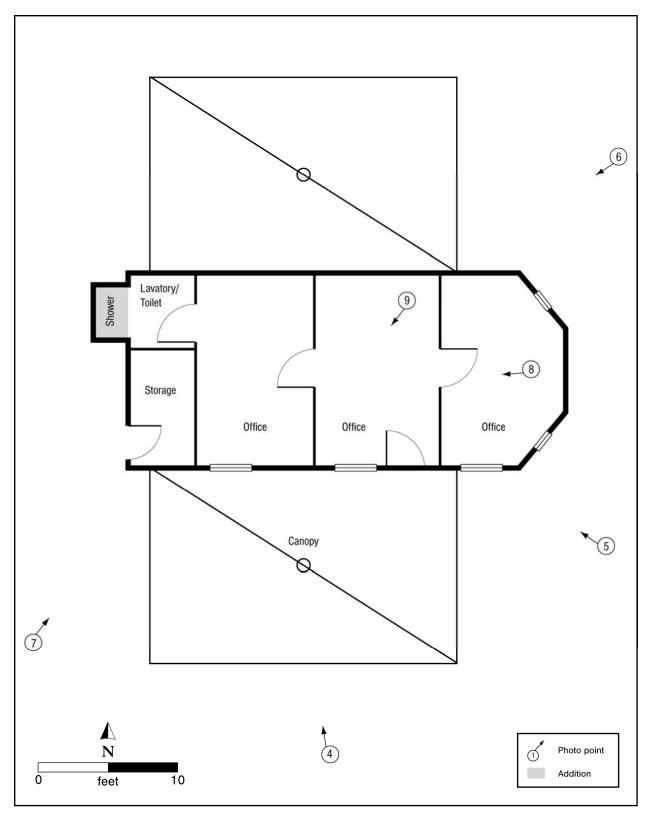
Floor plan of main building, 503 North Stone Avenue.
